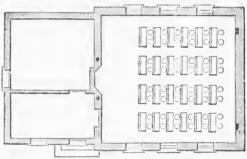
GROUND PLAN ADAPTED TO FIGS 61 AND 63.
